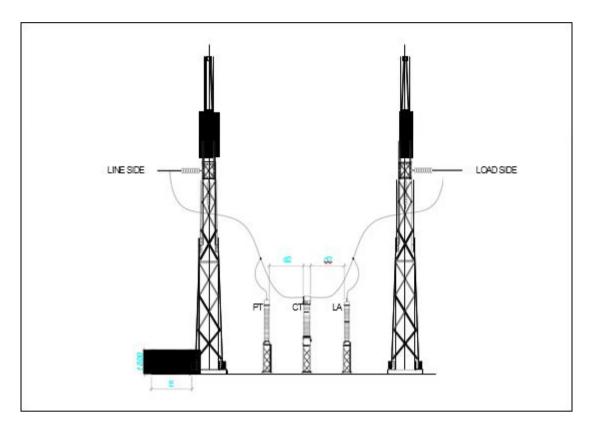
Tower Plan (Distance between Instrument Transformers)
